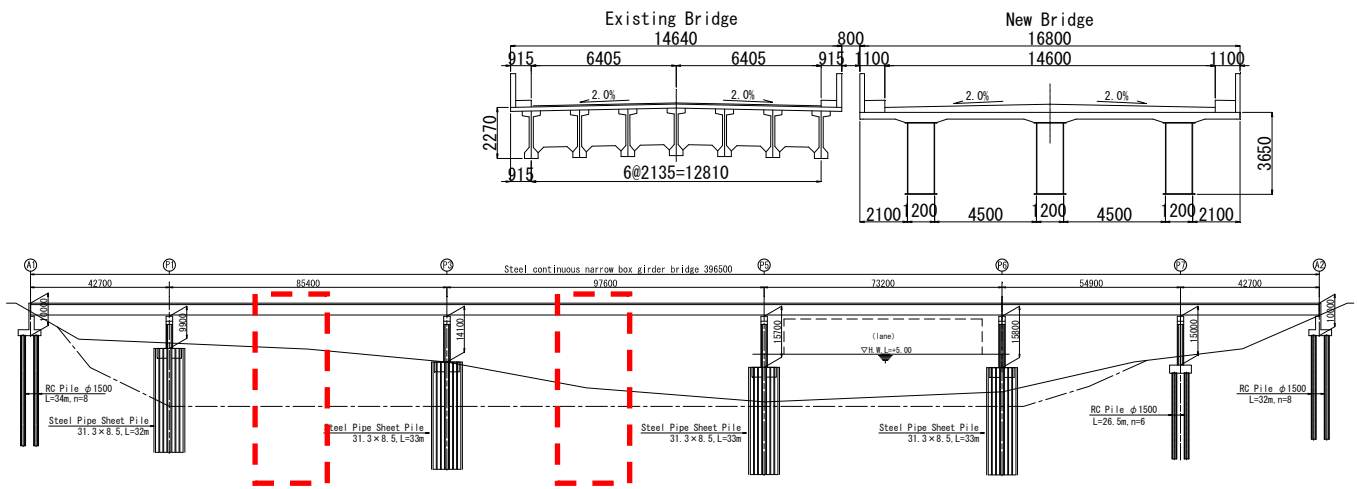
Cross-Section and Side View of Option-3 (Kanchpur Bridge)
